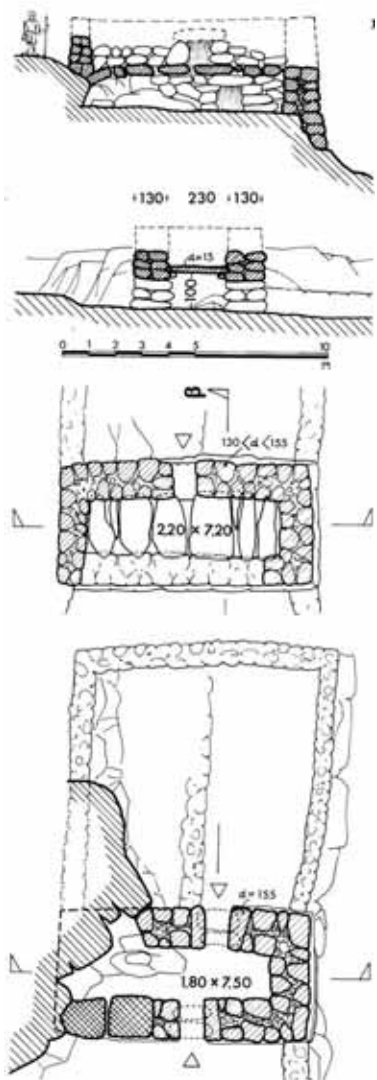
Megalithic house (kolospito, 9.80 m long) with a lower and an upper floor. From bottom to top: lower level plan, upper level plan, section by width, lengthwise section (Saitas, 2001)
